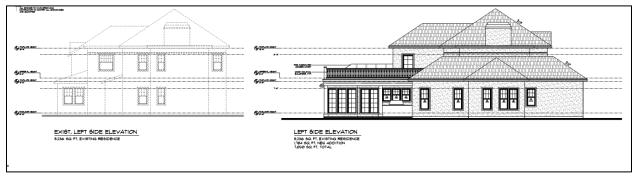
East elevation showing existing facade (left) and proposed modifications, including new east wing, lanai, and conservatory (right).
